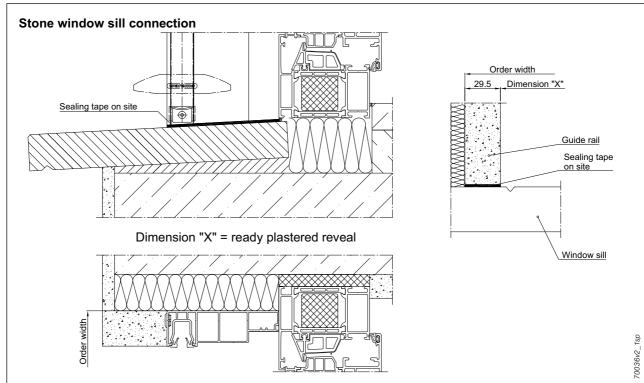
Window sill connection for guide rails - special situation: guide rail embedded in plaster at the front
